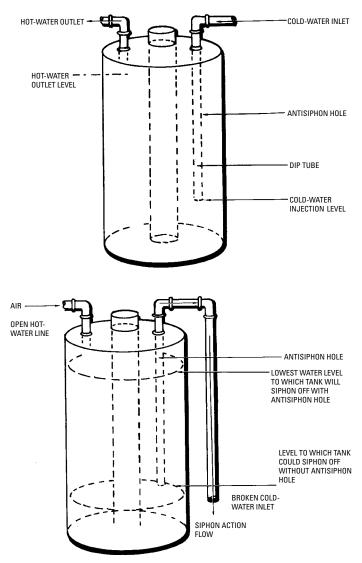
Dip tube and antisiphon hole. (Courtesy Robertshaw Controls Co.)
